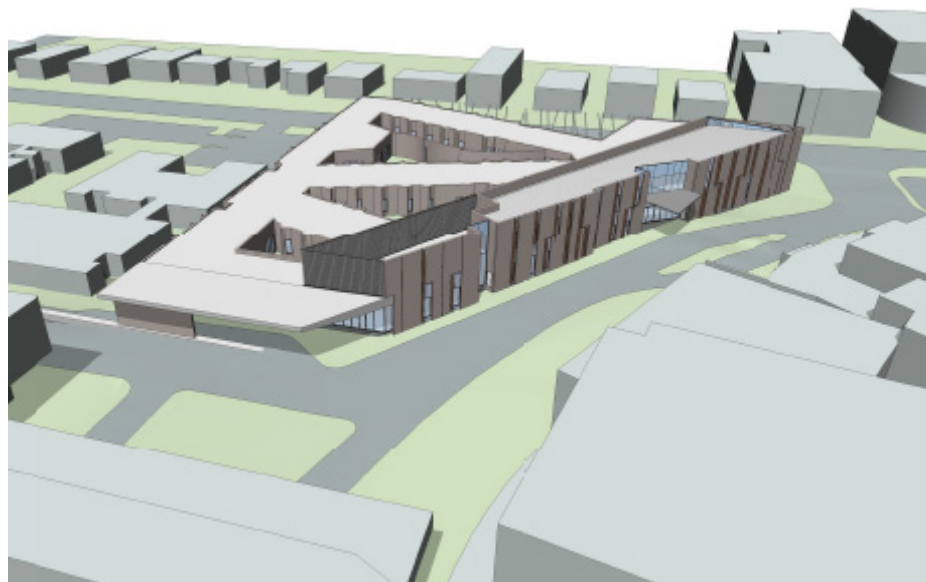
3D context model looking south over the proposed building to Derby Street
